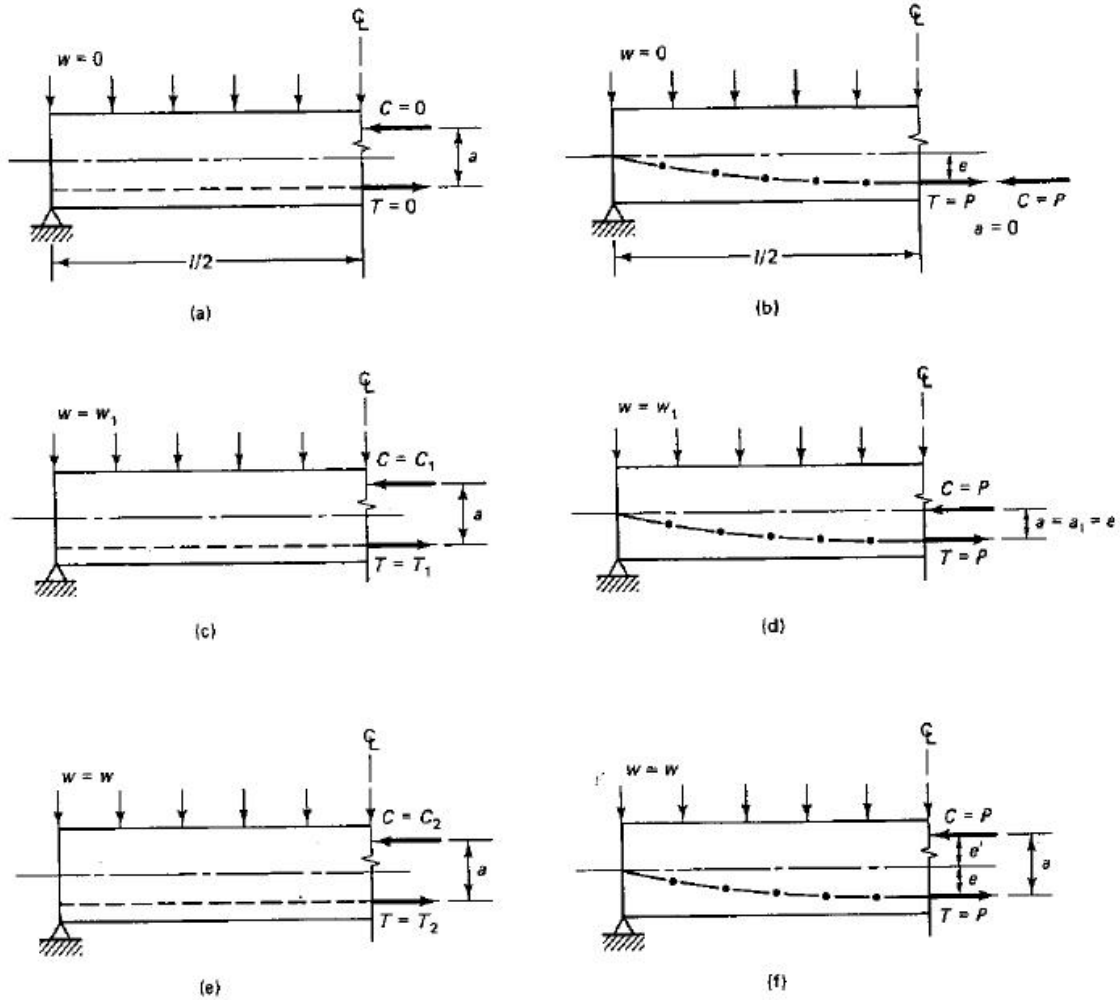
Comparative free-body diagrams of a reinforced concrete (R.C.) beam and a prestressed concrete (P.C.) beam. (a) R.C. beam with no load. (b) P.C. beam with no load. (c) R.C. beam with load w_1 . (d) P.C. beam with load w_1 . (e) R.C. beam with typical load w . (f) P.C. beam with typical load w .
